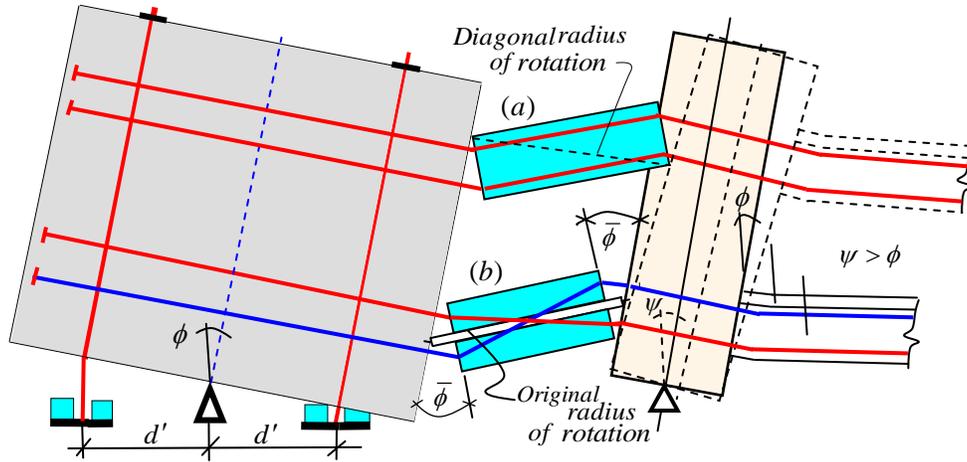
Rotations of link beams and adjoining walls (a), Full bearing both sides, (b) Both ends hinged
